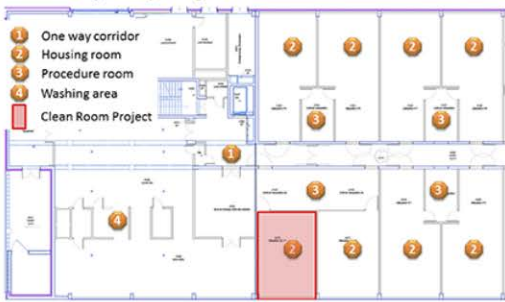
Layout of the breeding facility (ground floor); Red square shows one of the housing room where the Biobubble clean project room has been installed.
